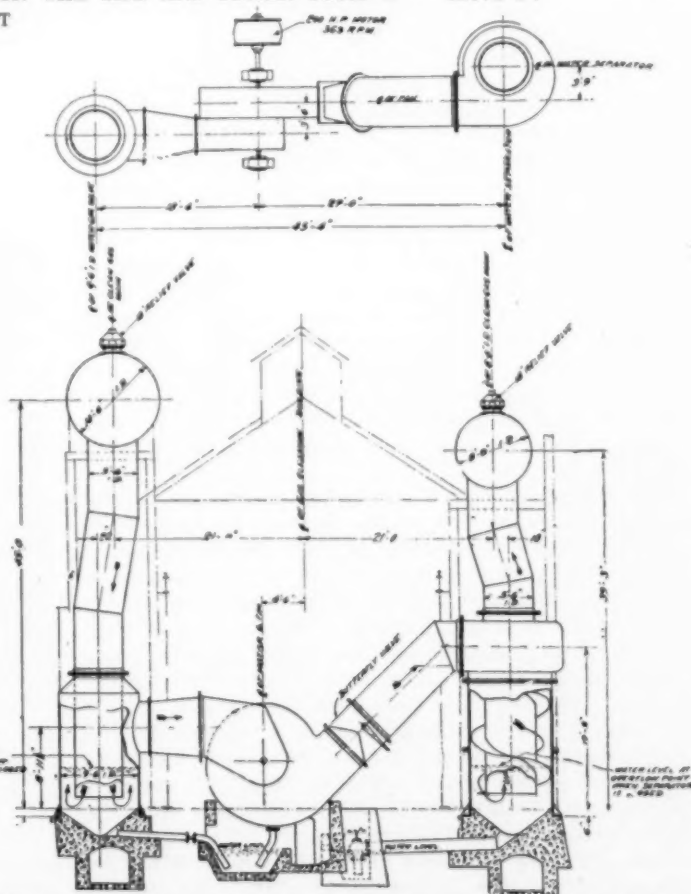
SECTION THROUGH FANS, AND METHOD OF PASSING GAS THROUGH SEALS AND SEPARATORS
